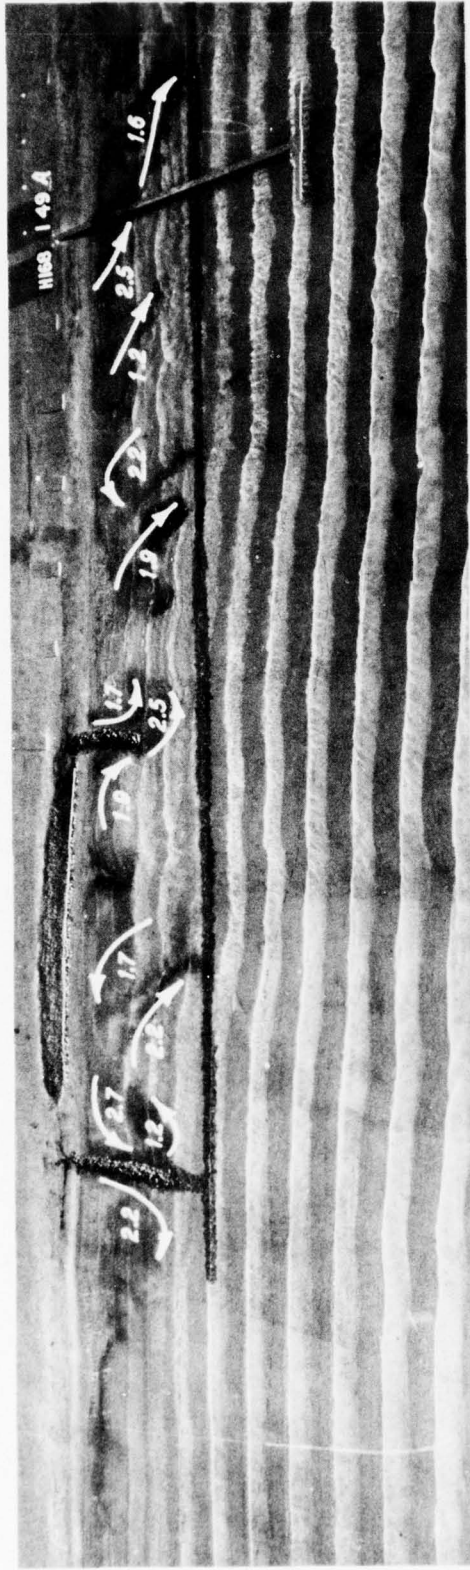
Typical wave and current patterns and current magnitudes (prototype feet per second) for Plan 4; 7-sec, 11-ft waves from west at mllw
